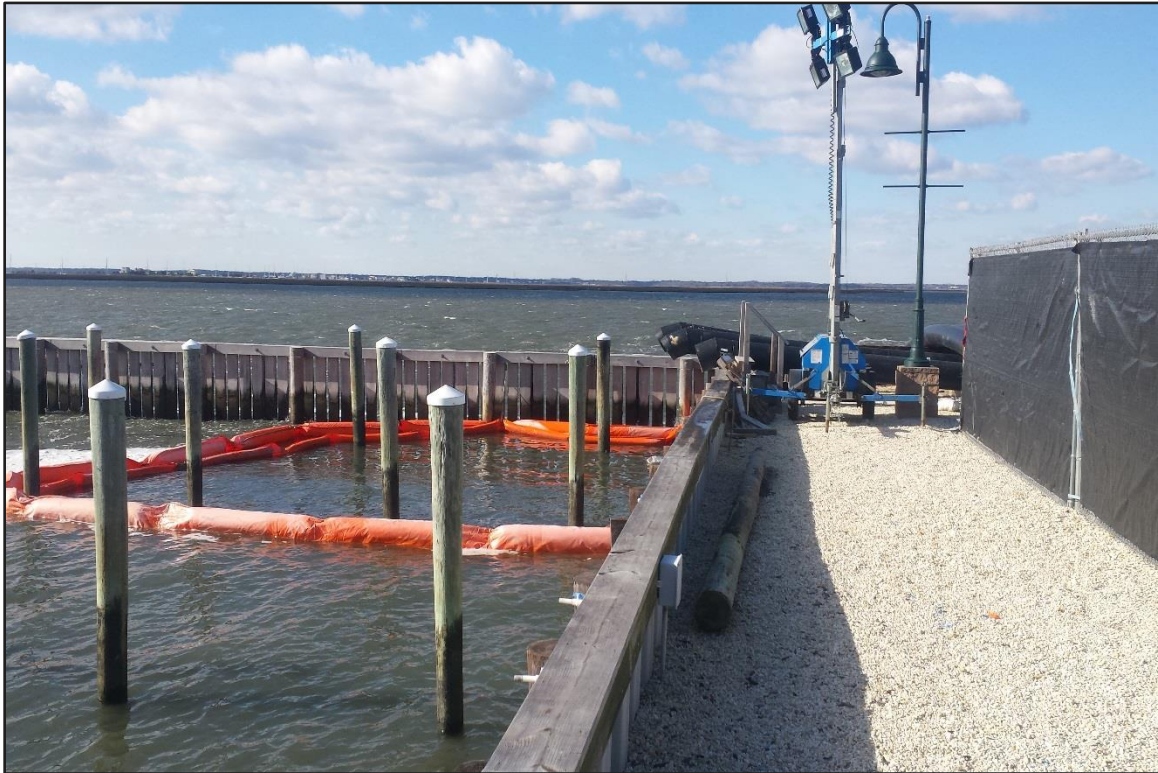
De-watering Area – Sump pump on standby. (Looking southwest)
